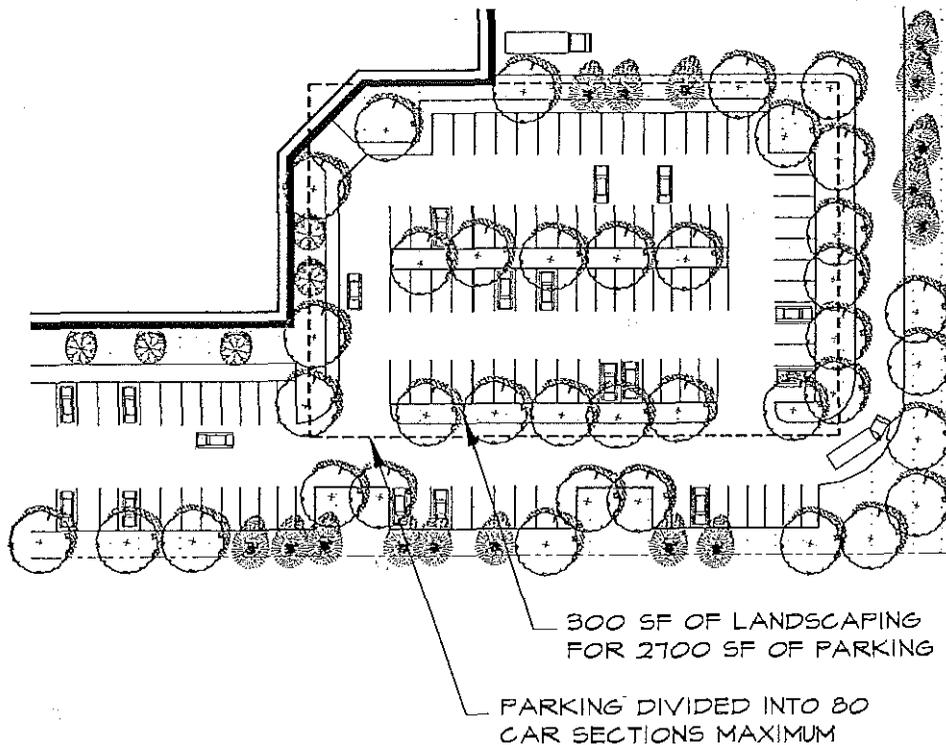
TYPICAL PARKING AREA - 80 CAR
